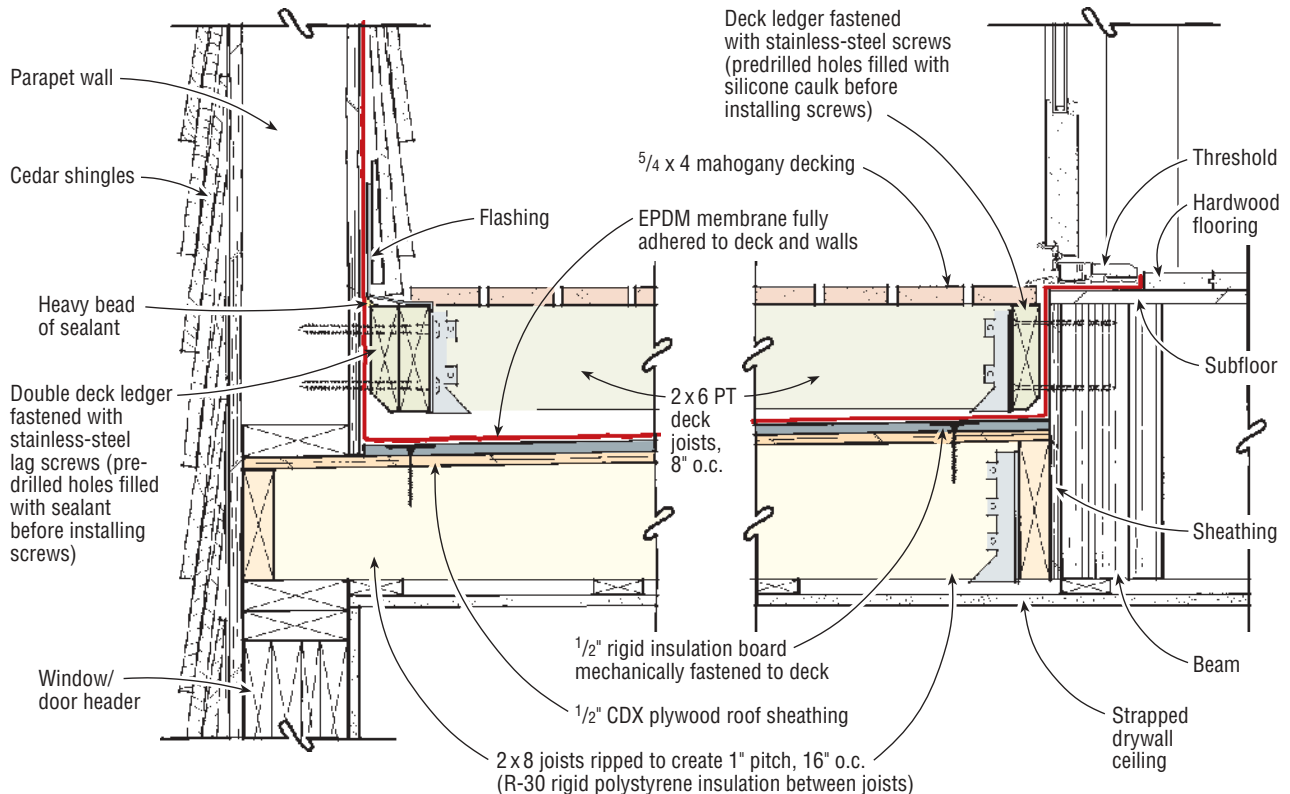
The author's design for rooftop decks protects the structure and living space of the room below with a continuous EPDM roof. To allow free drainage and protect the roofing, the deck frame is suspended from the parapet walls.
